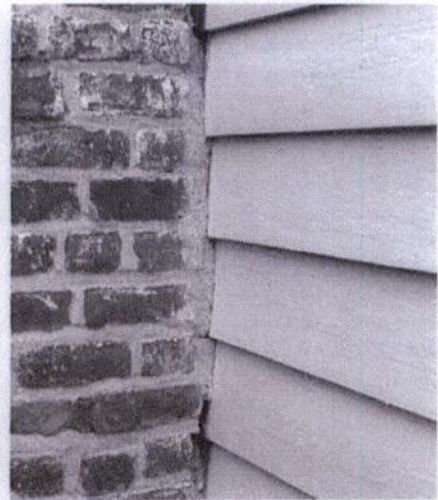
Appropriate mortar mixes should be used when masonry repairs are undertaken. In this case, a soft lime based mortar is used as an infill between the brick and wooden elements. When full repairs are made during the restoration phase, this soft mortar can easily be removed and missing bricks replaced.
